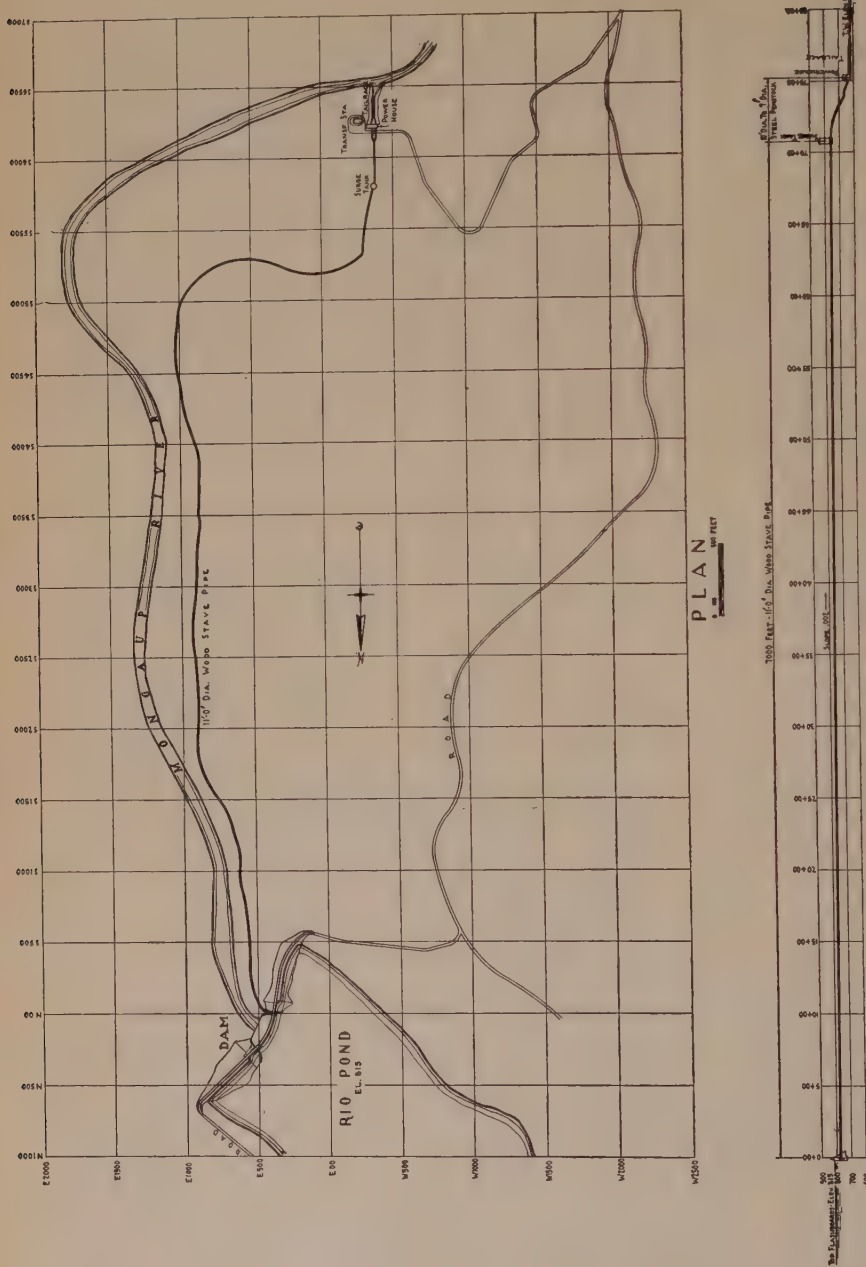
GENERAL PLAN AND PROFILE OF RIO DEVELOPMENT
